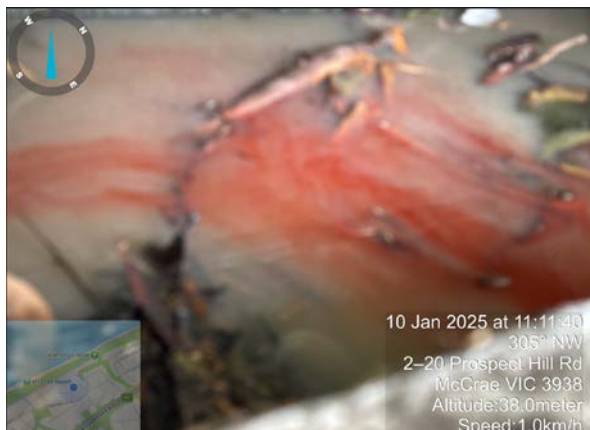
2 View Point Road Stormwater curb collector facing Prospect Hill Road across from 9-11 Prospect Hill Road.
